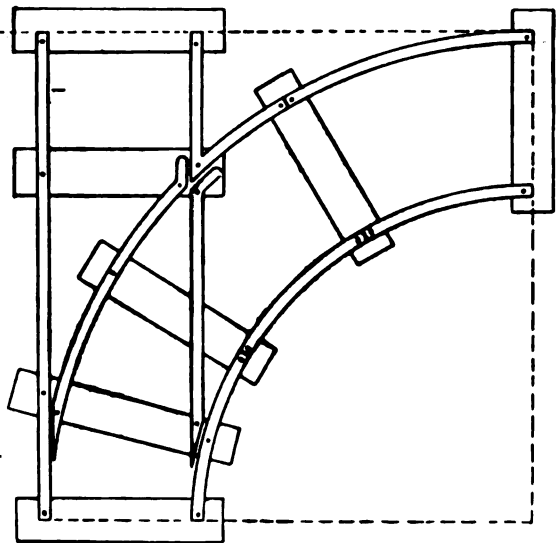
REVERSIBLE RIGHT-ANGLE TURN.
